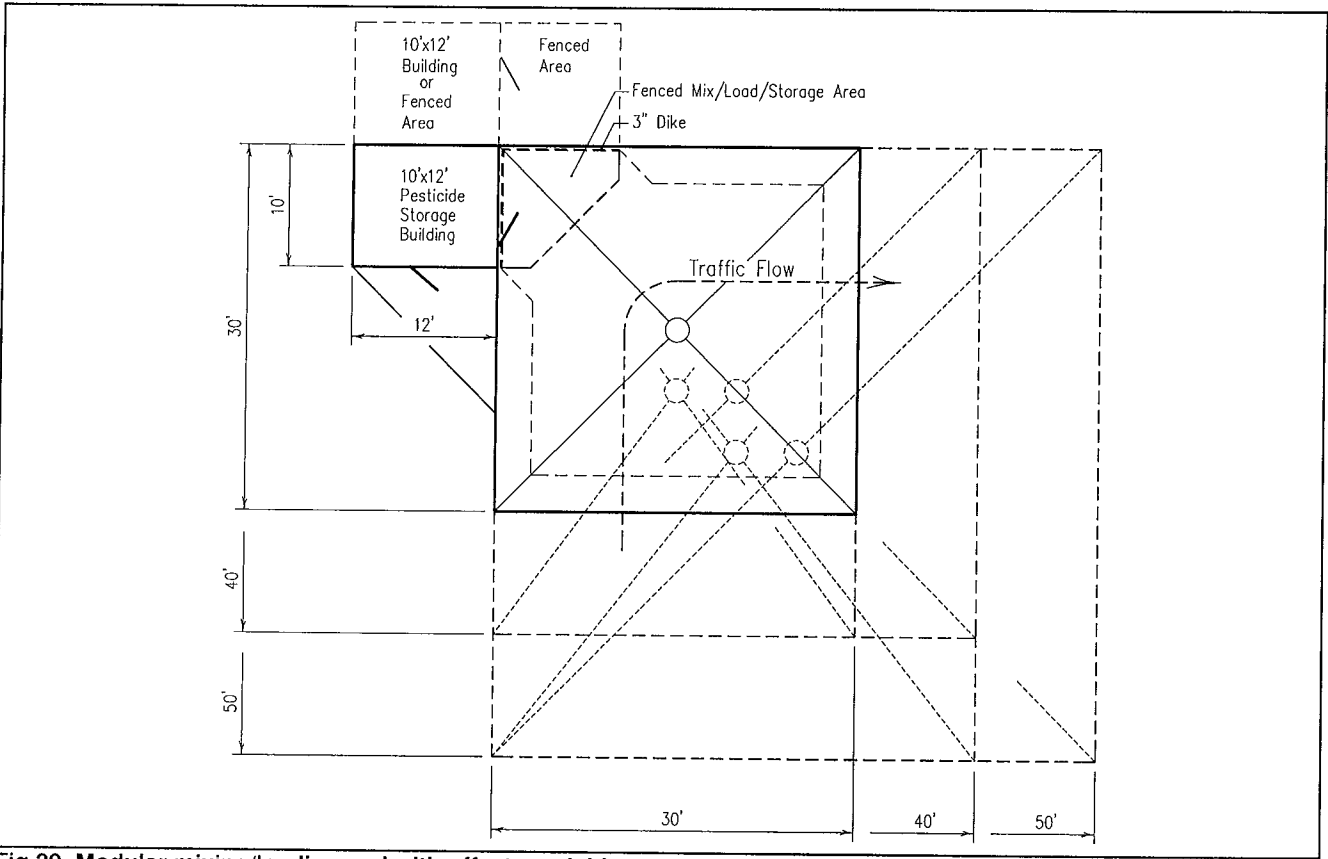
Modular mixing/loading pad with offset pesticide storage building abutting corner of pad.
